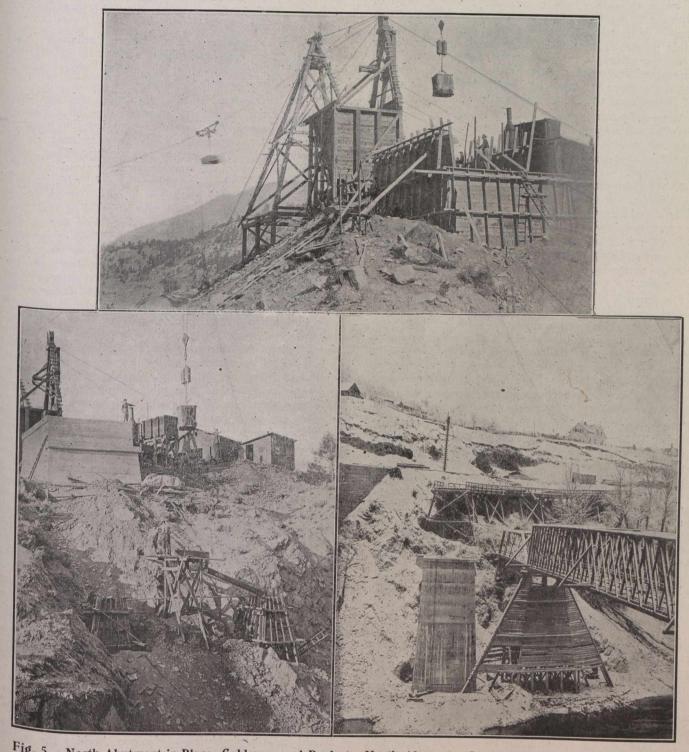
North Abutment in Place, Cableway and Bucket. North Abutment Completed and Pedestals of Steel Bent. South Pier and Timber Trestle Approach.
